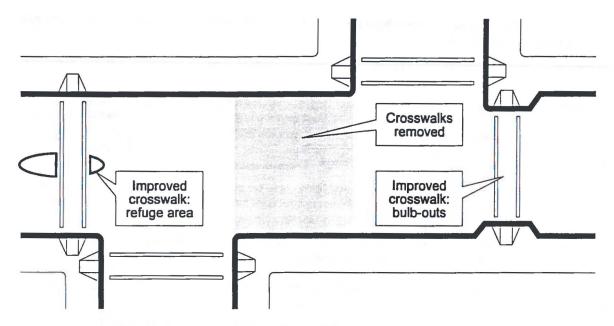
Improved offset intersection crosswalks to encourage their use. (adapted from the Portland Pedestrian Master Plan)
